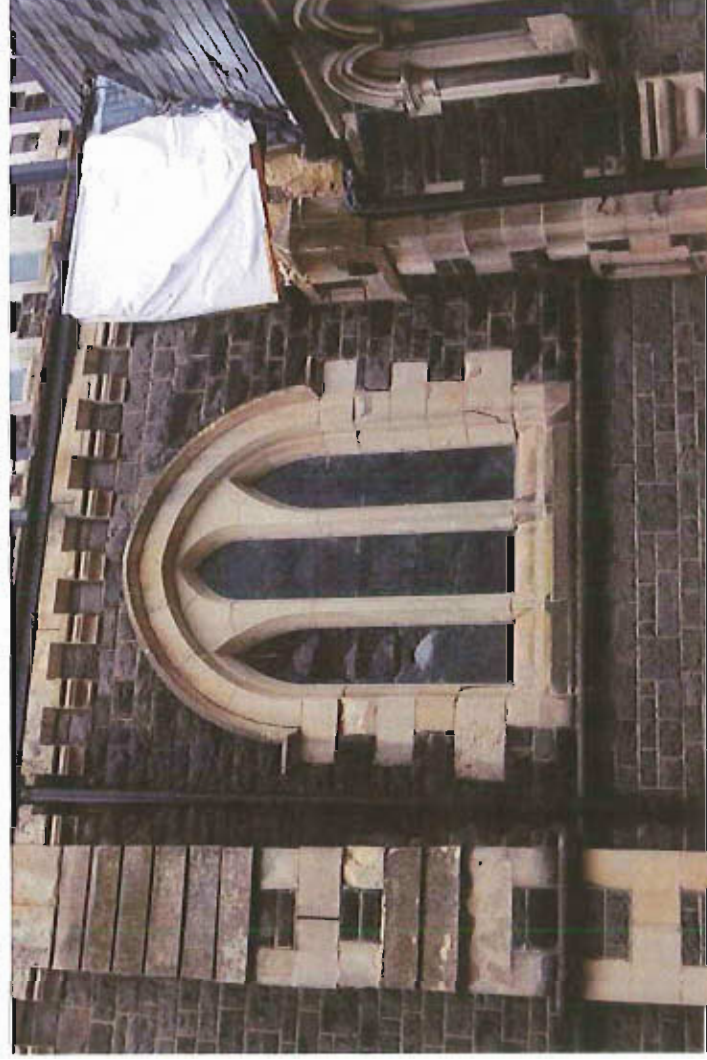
Guttering to the south aisle and porch with water saturation of the wall behind the downpipe indicating a blockage or disconnection.
